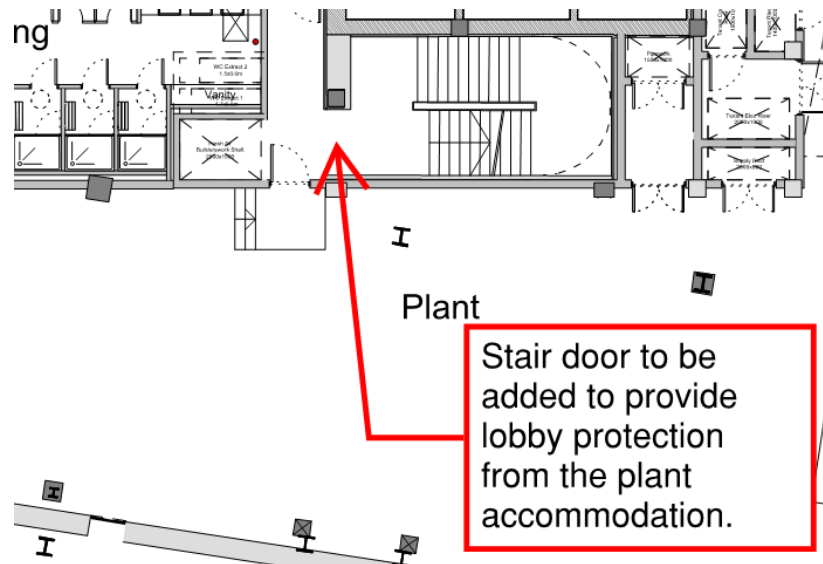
Lobby protection to be provided to escape stair 3 on the basement floor
